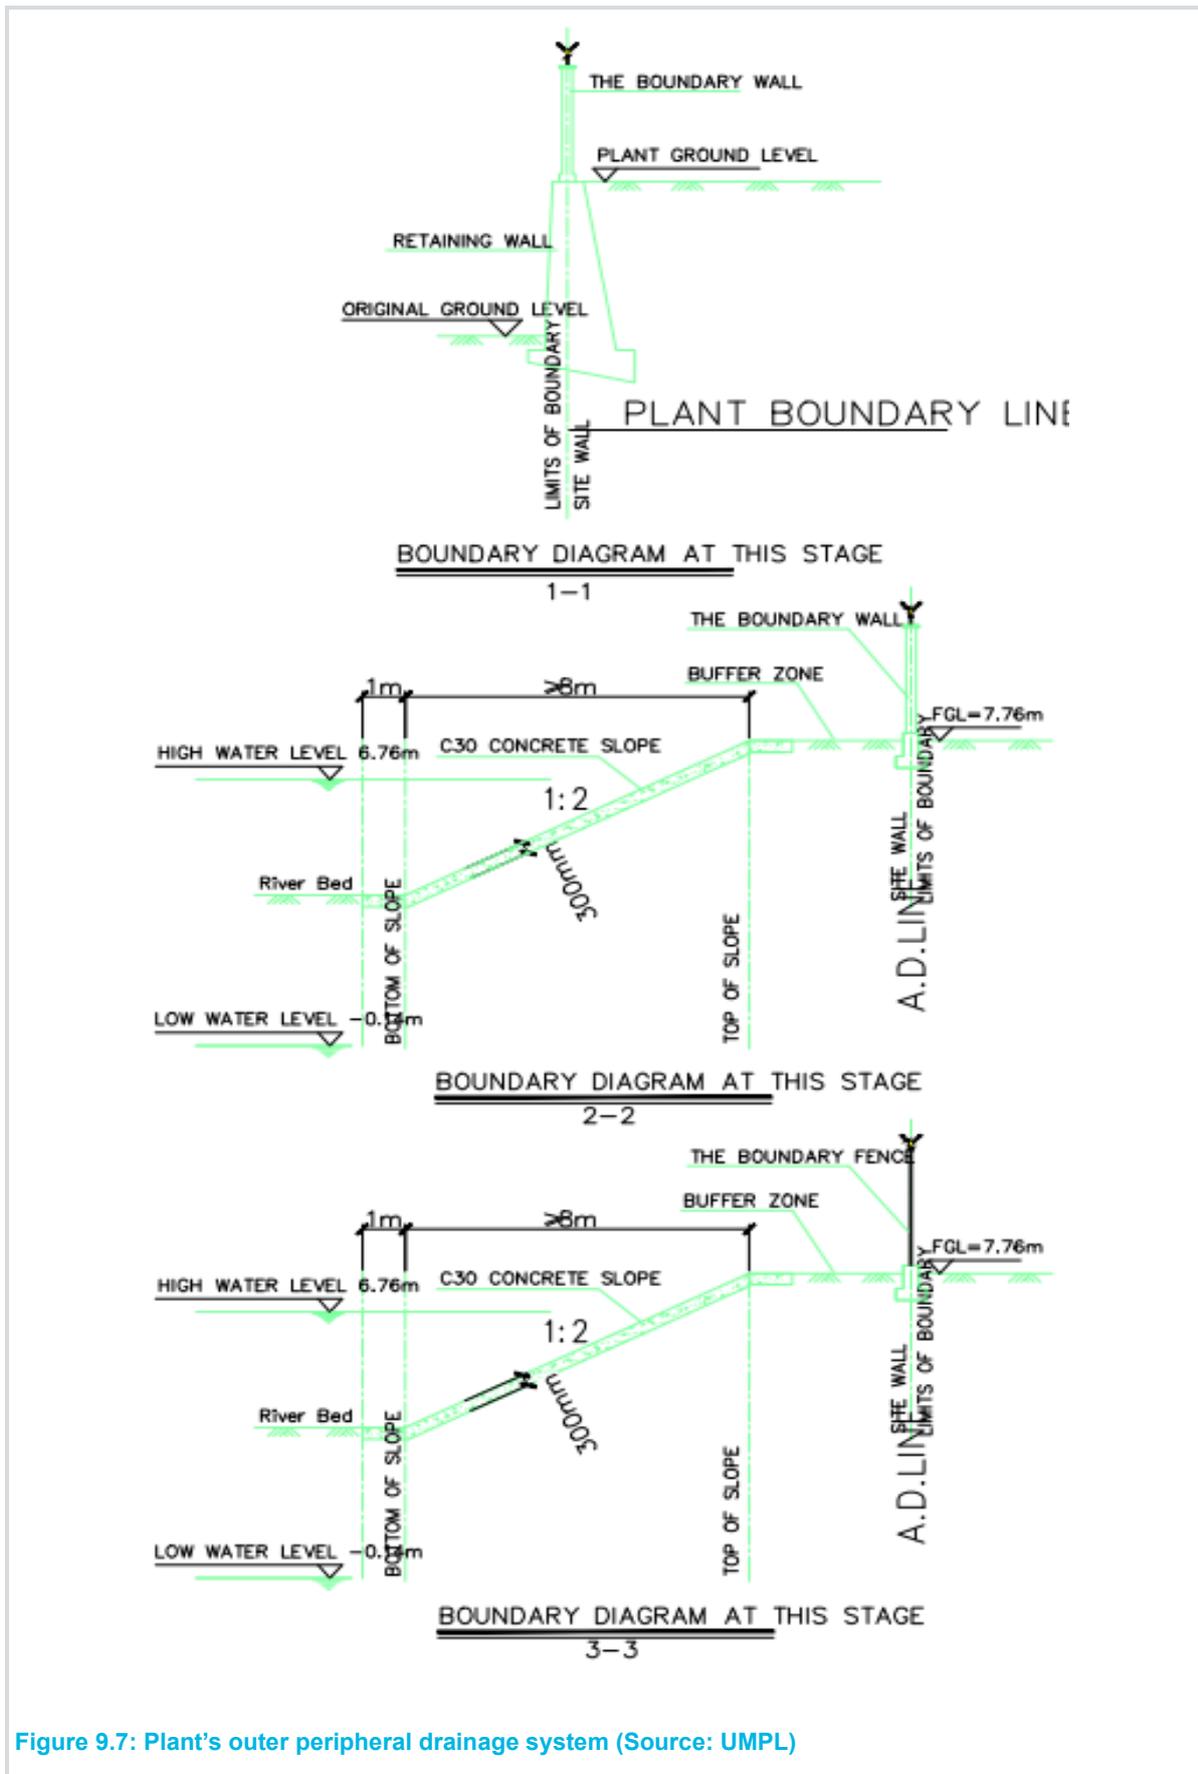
Plant's outer peripheral drainage system (Source: UMPL)
